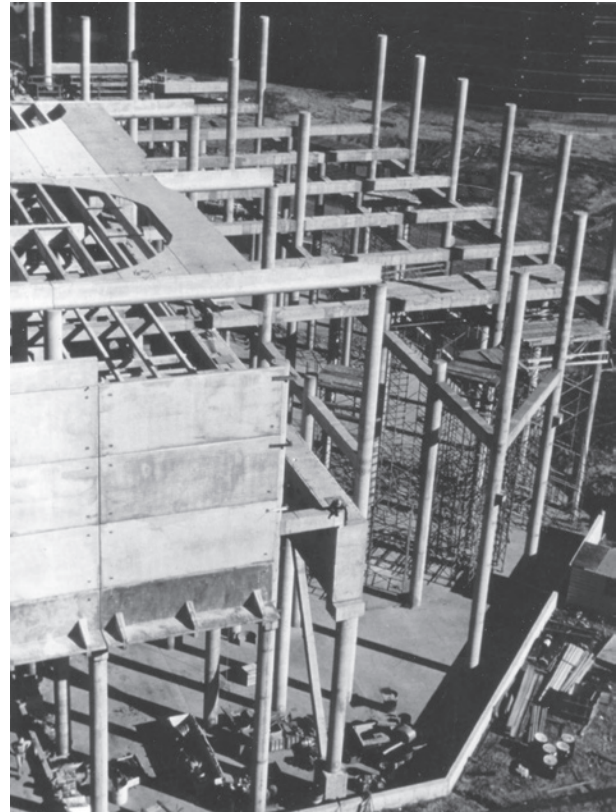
Basin and basic framework of an octagonal mechanical draft tower in concrete construction.
